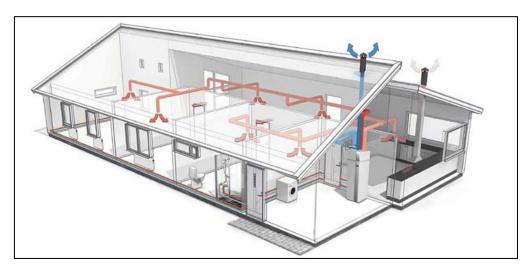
Example Diagram of Typical Exhaust Air Heat Pump Layout
